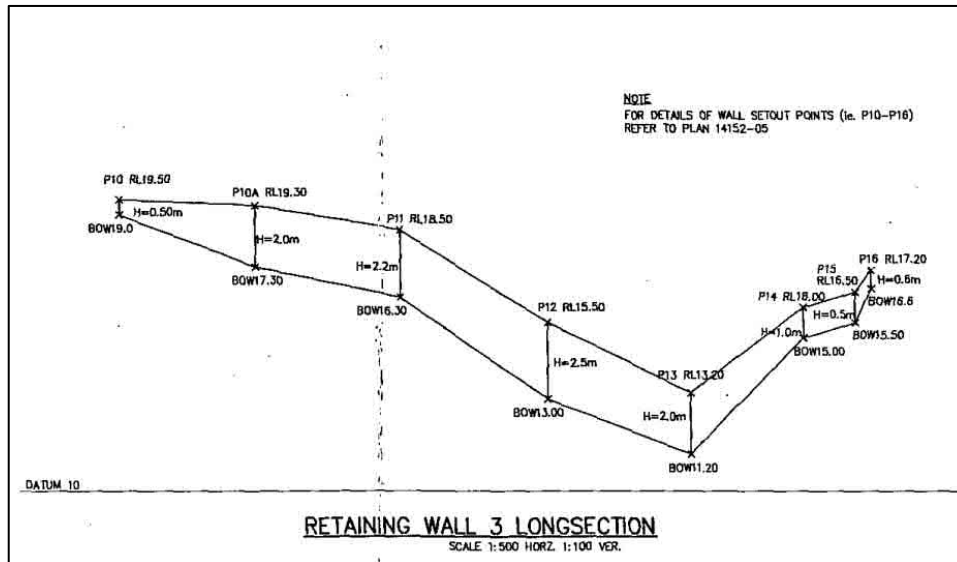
Existing Timber Retaining Wall Design Long Section from Property File (2002)
